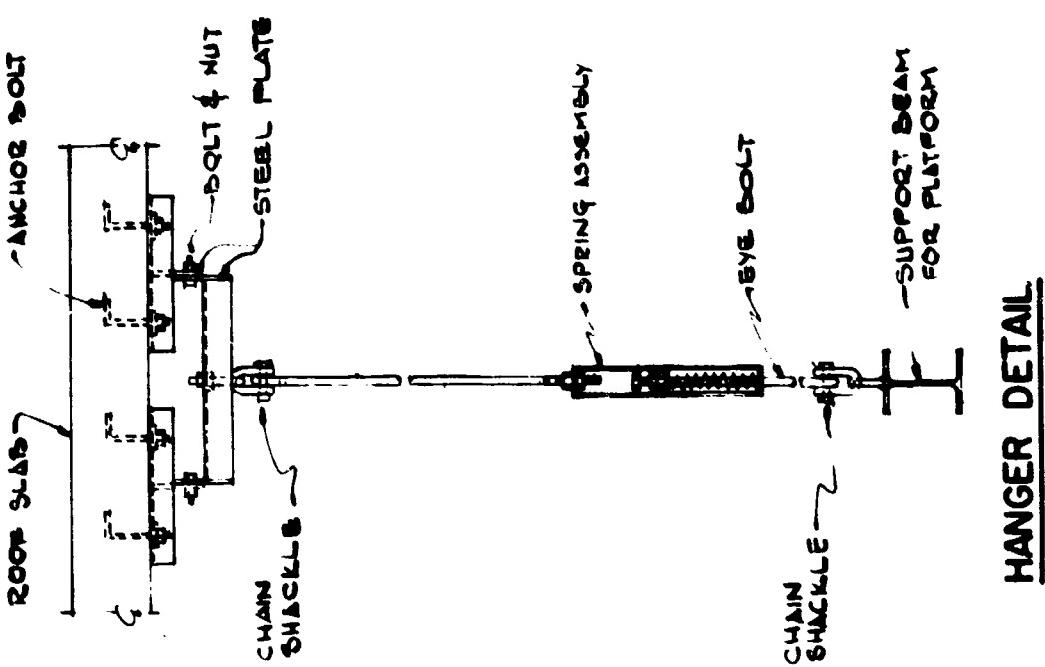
TYPICAL PLATFORM HANGER AND BALLAST DETAILS
